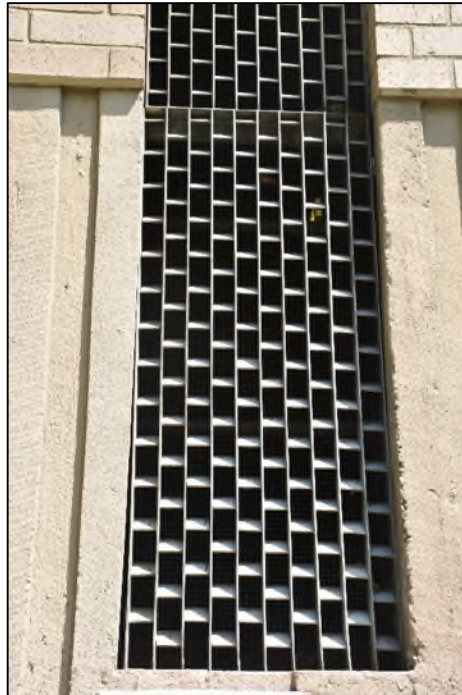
Hall Towers (GF9105), side elevation, grate detail, facing north.
